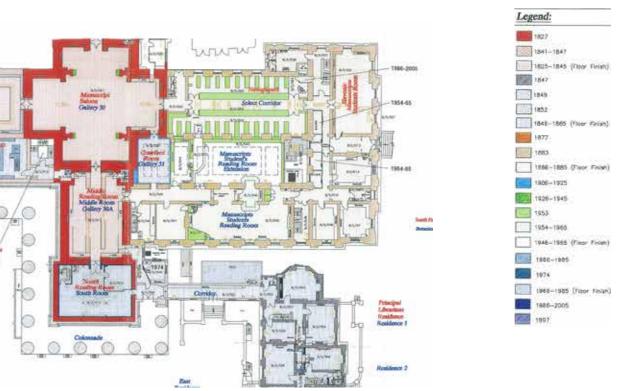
Level 02 Historical Development Plan (extract from Conservation Plan)
